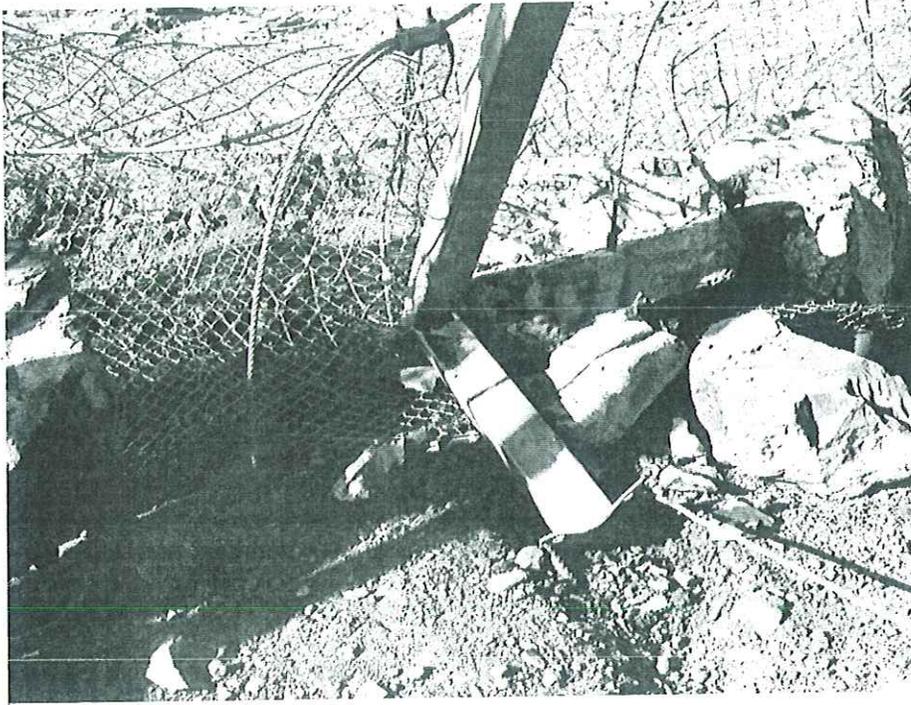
COLLAPSED INDUSTRIAL ENTERPRISE STEEL BOX POST #2 AFTER IMPACT BY A 11/4-TON ROCK. NOTE LOW ROCK NET HEIGHT AT TOP OF PHOTO
